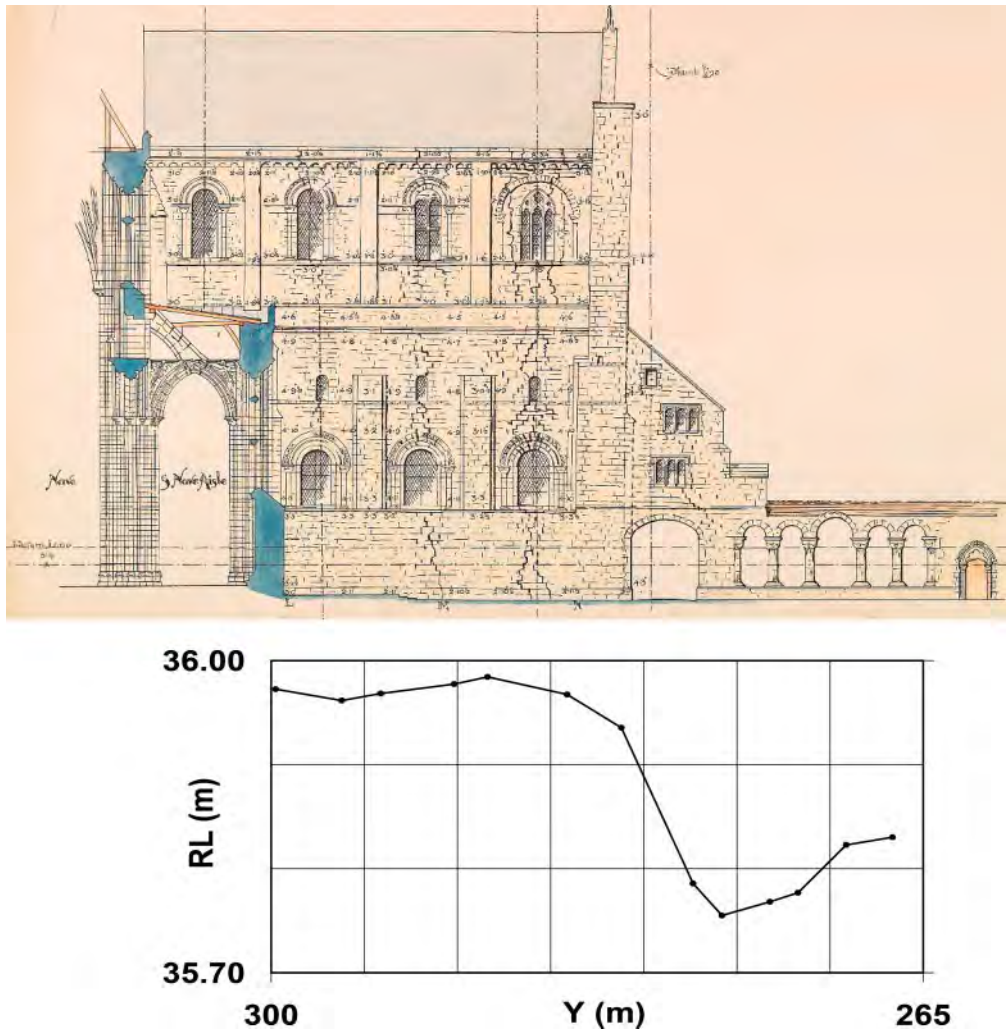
South Transept west elevation showing section through the south aisle of the Nave (Yu 2006).
